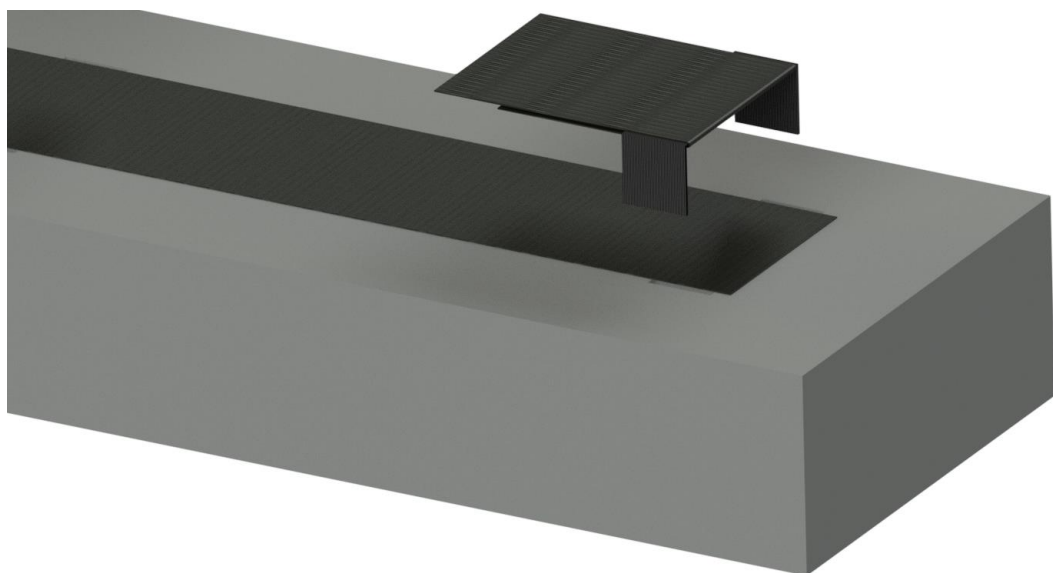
Detail of the flat staple anchorage system on a slab
